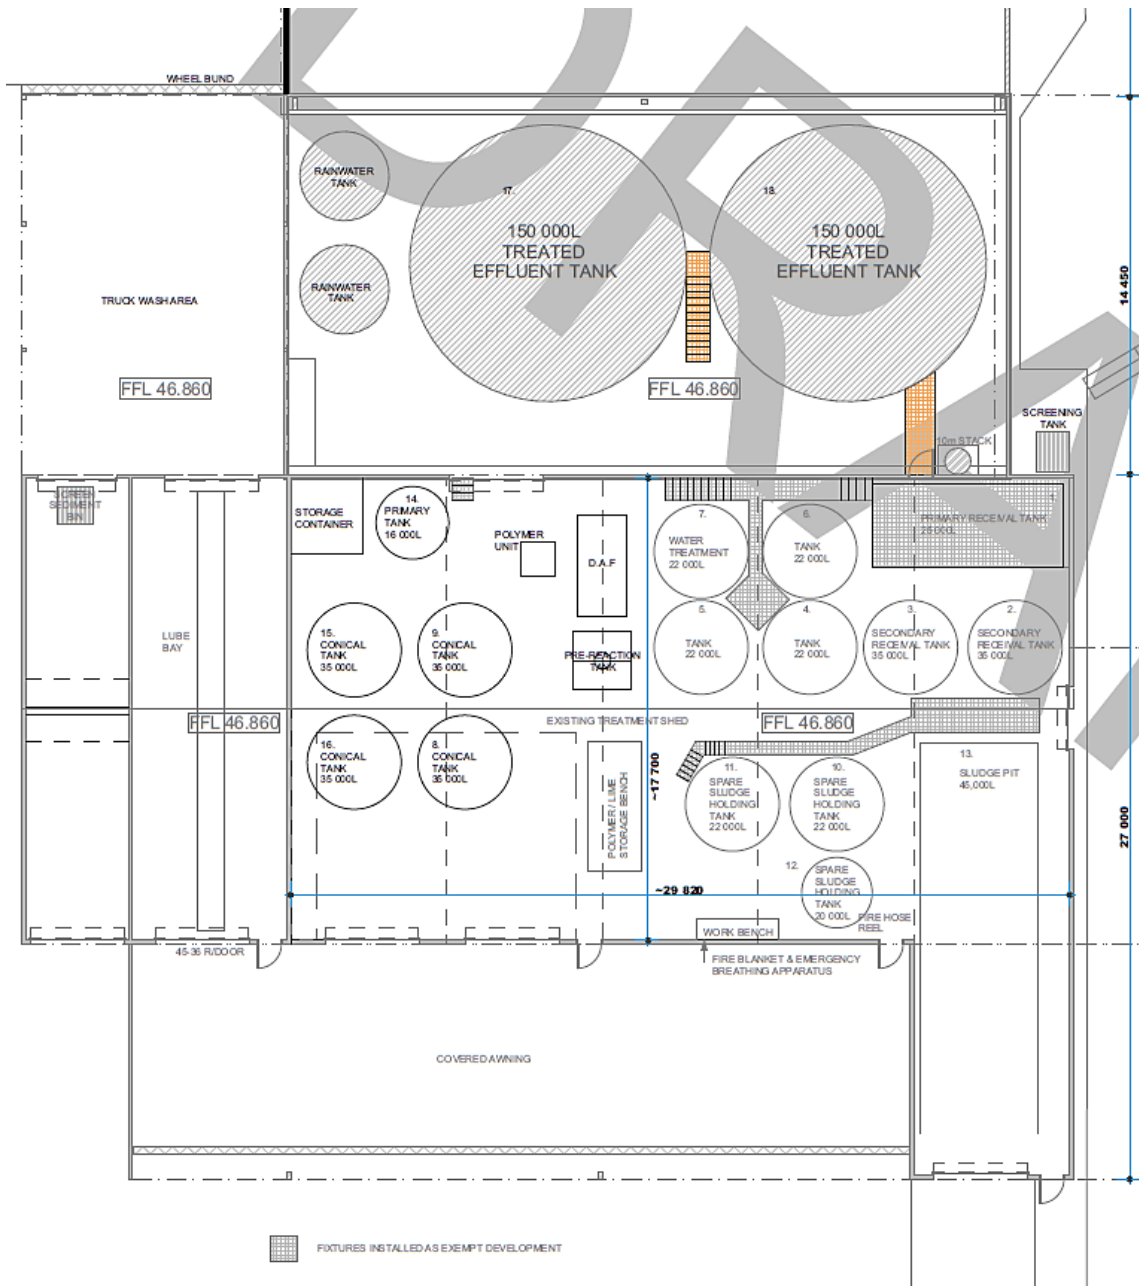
Amended plan of internal layout of main building showing treatment process and storage tanks
